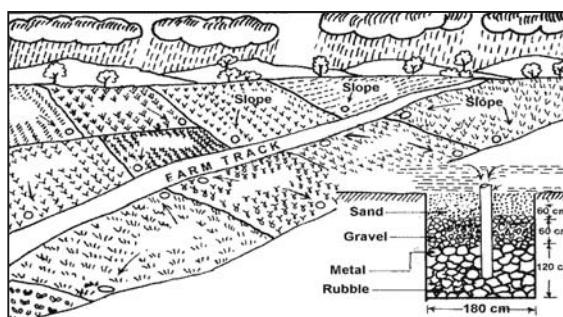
Excavating soak trenches at the end of farm slope.
